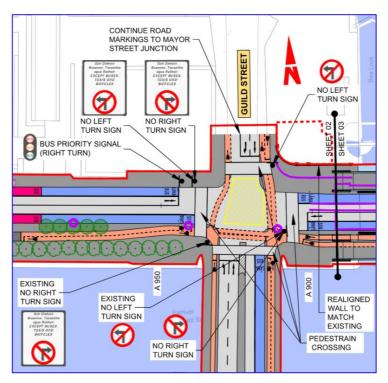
Proposed Traffic Turn Restrictions at Guild Street Junction
